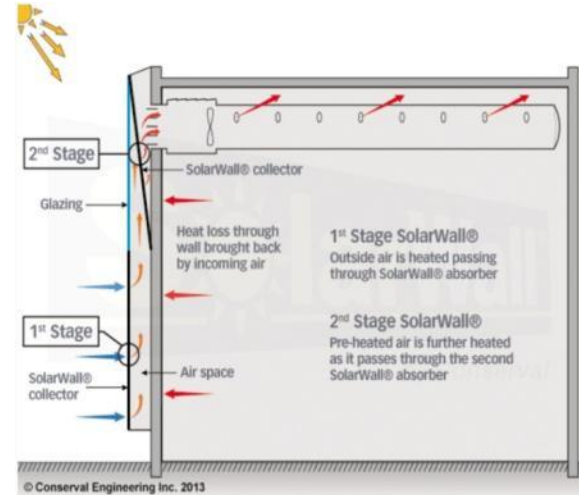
2-Stage SolarWall patented system® with Interior Fan.
